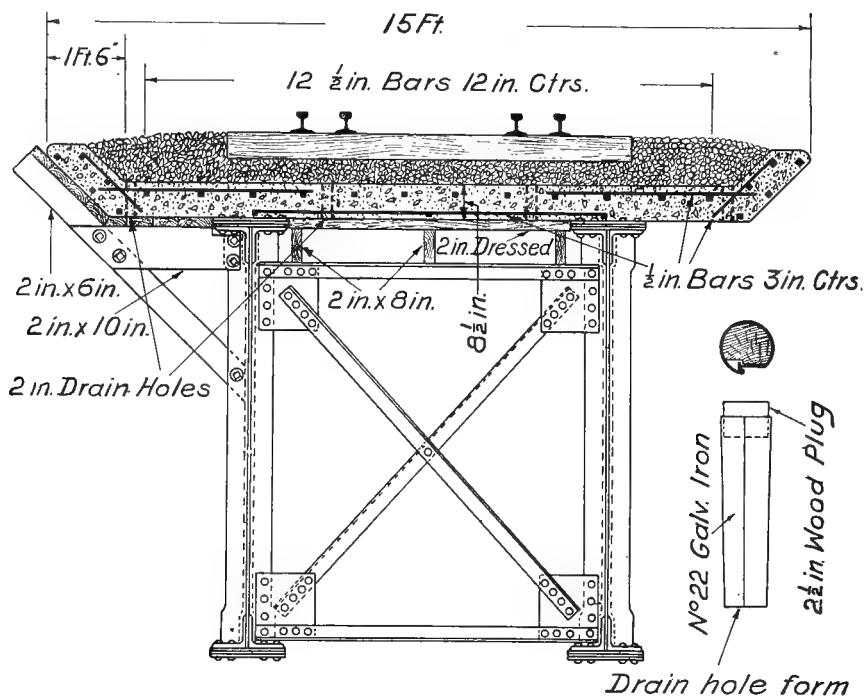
CROSS SECTION, DECK GIRDER BRIDGE FLOOR, C., B. & Q. R. R.
